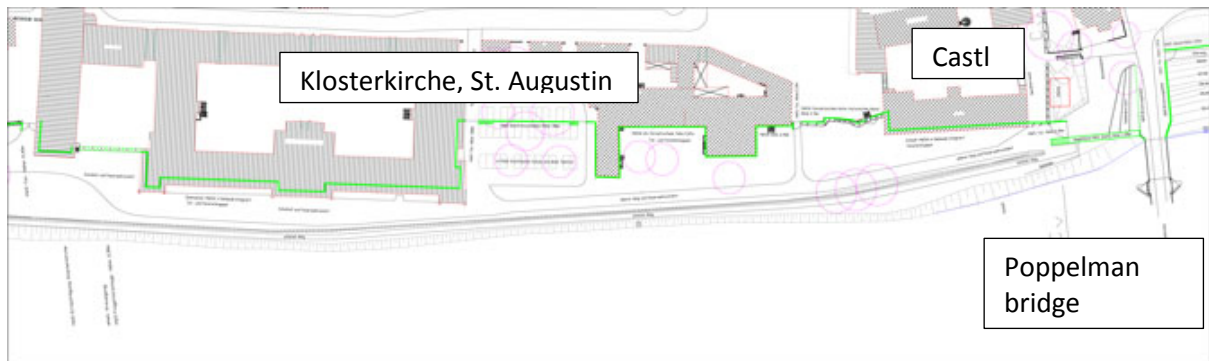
Project 3 layout (hochwasserschutz-grimma.de)
